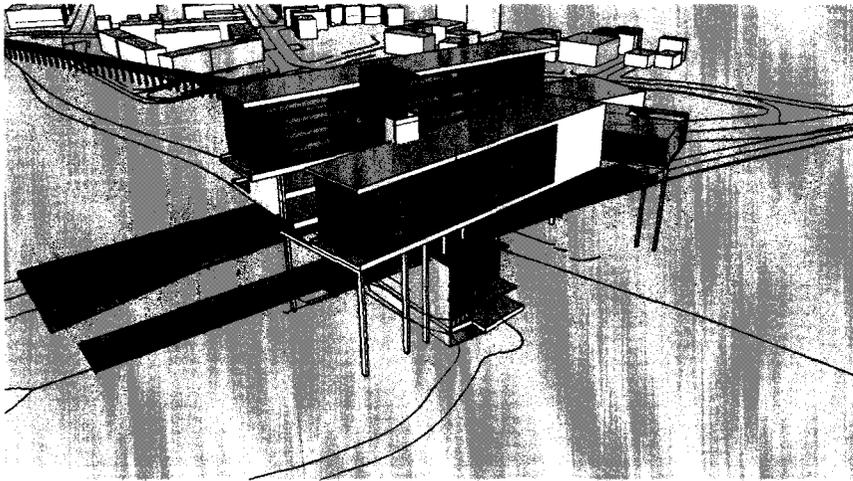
Image of the Bayview Terminal Residential building looking southwest along the O-Train Line. Using the vertical spaces situated above the Scott Street bridge and its associated OC Transitway Bridge (forward of the two) as a stable site for building. It connects the roadways, the existing OC transitway, O-Train terminal and the new Bike pathway (background, left) in an intermodal corridor above City Right of Way. Oriented to take advantage of the landscape views of LeBreton Flats, NCC parklands and the Ottawa River – see site plan above – Figure 22.
